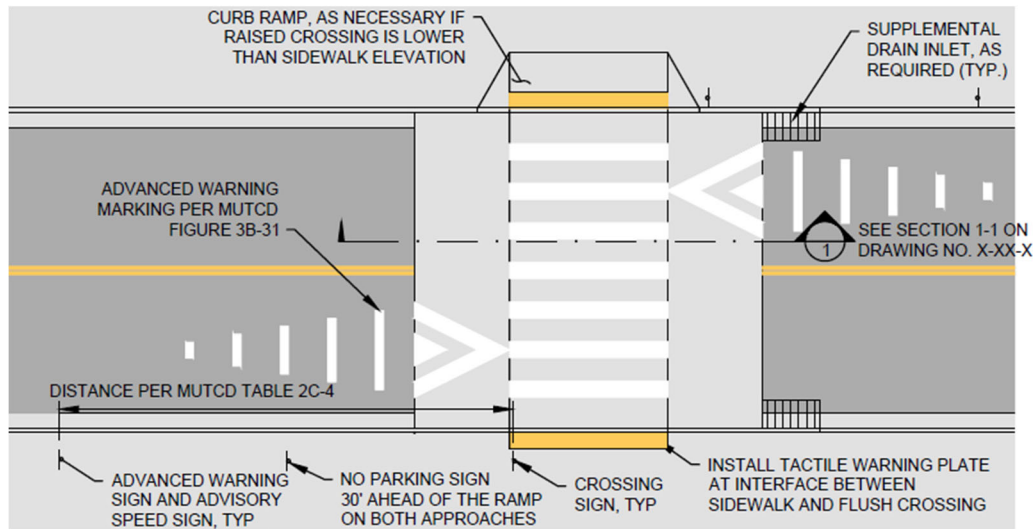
Typical Layout of Raised Crossing at Mid-Block Location
